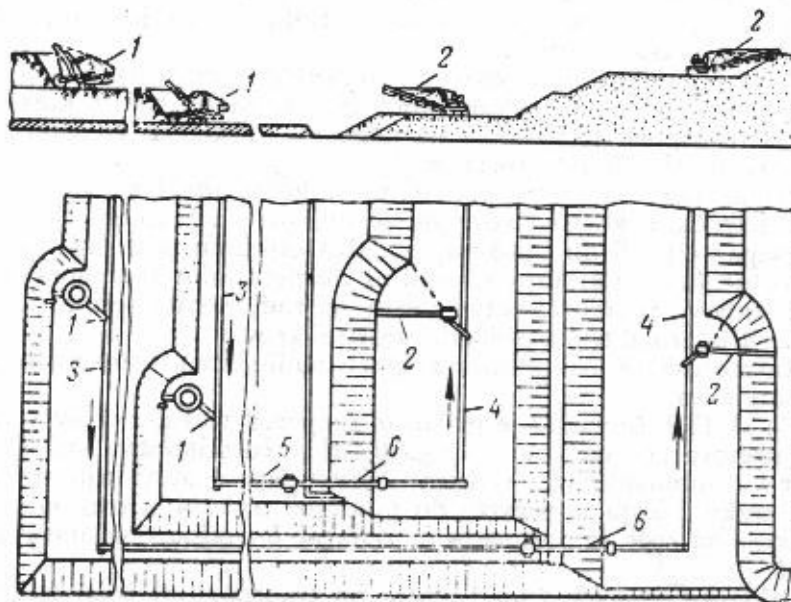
Schematic representation of an open pit (1-dredge; 2-stacker; 3-transport belt conveyors; 4-stacking conveyors; 5 and 6-load and haul belt conveyor)
